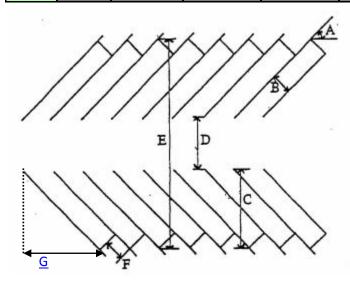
A-General: Off-Street Parking Matrix (General)
